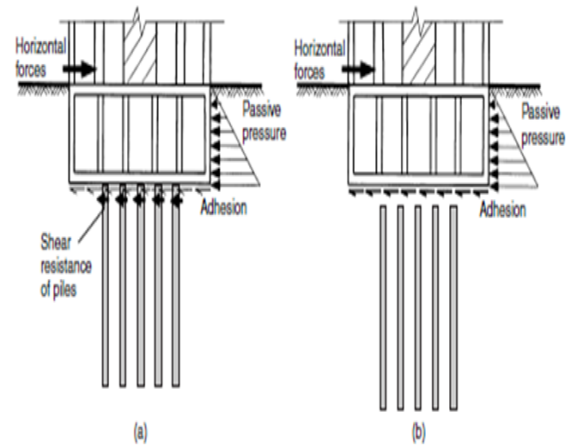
View of lateral load transfer in the pile raft foundation a) Piles connected to a raft foundation b) Piles non-connected to a raft foundation
